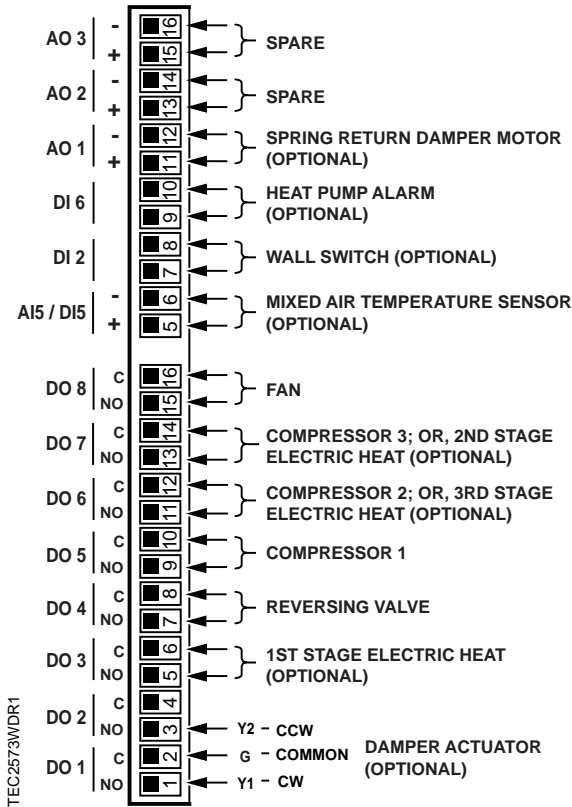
Application 2573 (Multiple Compressor Heat Pump with Reversing Valve Control and Mixed Air Control).
